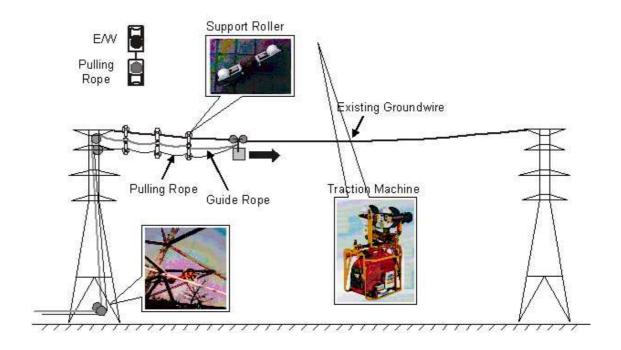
INSTALLATION OF SUPPORT ROLLERS
